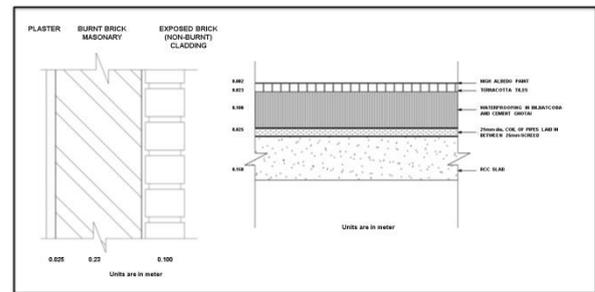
a. Cross section of Wall and b. Roof for calculation of Thermal Transmittance
